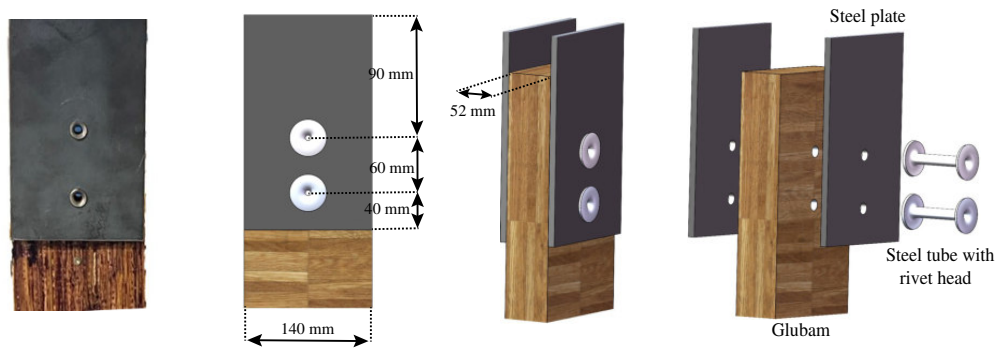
Detailed geometry of the riveted steel to glulam joints.
